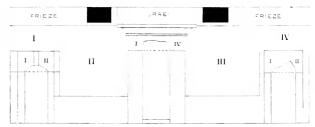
Second Pillared Hall: East Wall. Scale 1: 100.
